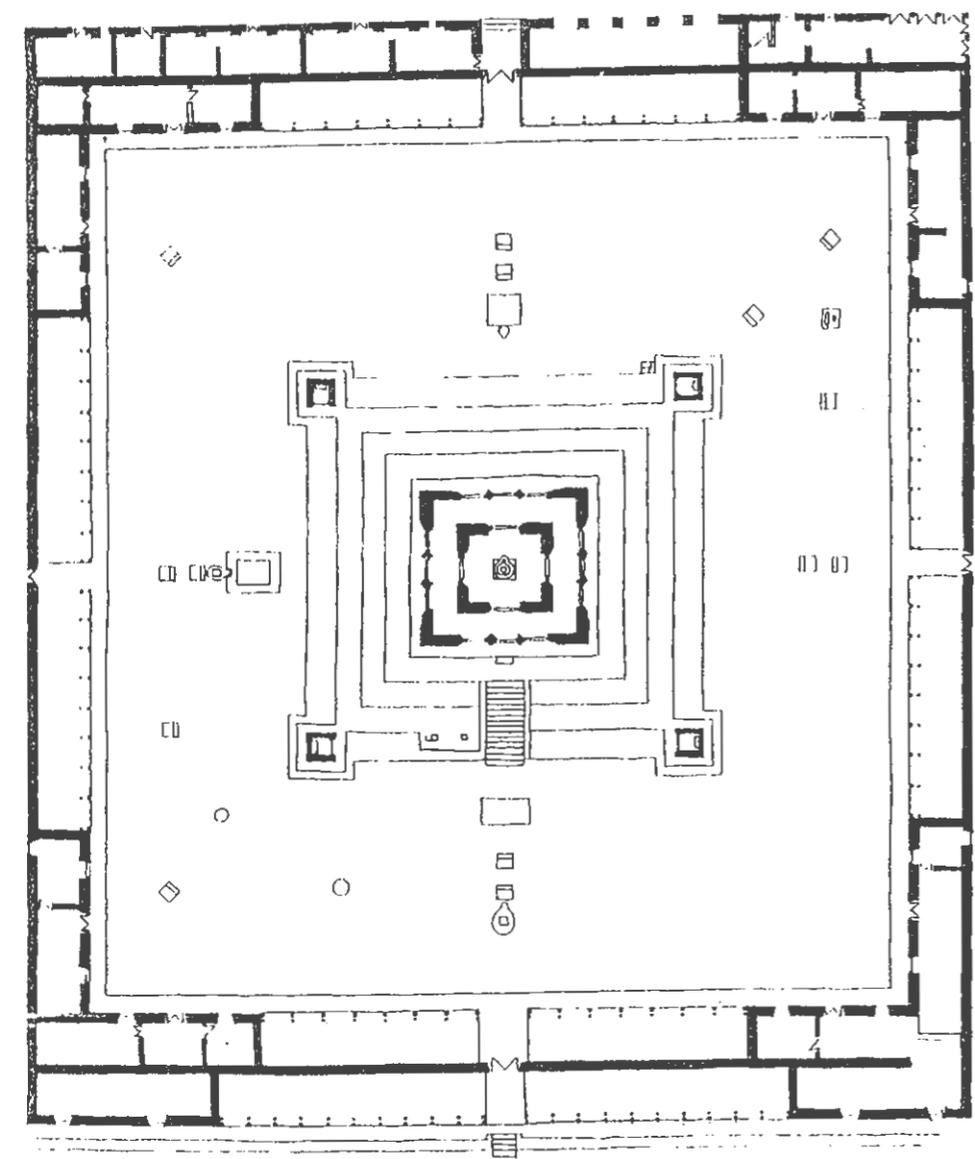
Sketch Proposal for the Ground Floor Plan; families occupying *pati* space on the ground floor have been relocated in the now restored upper level. Public *pati* space is reclaimed for traditional and possibly new community uses.
